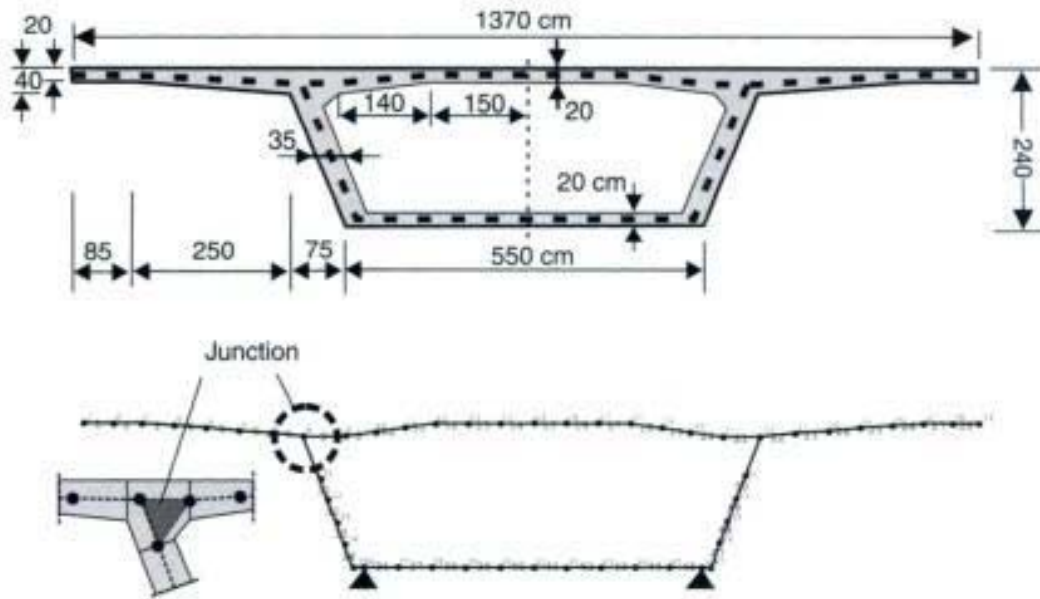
Cross-section and resulting truss model of a hollow box girder bridge (standard segment, Second Stage Expressway, Bangkok)
